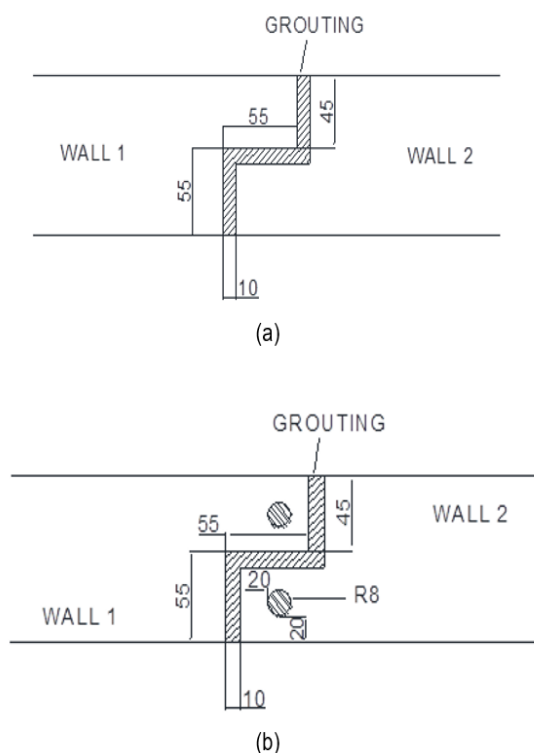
Schematic diagram of proposed vertical wall-to-wall connection in plan view. (a) Type 1 (Dapped wet), and (b) Type 2 (Lightly reinforced dapped wet)
